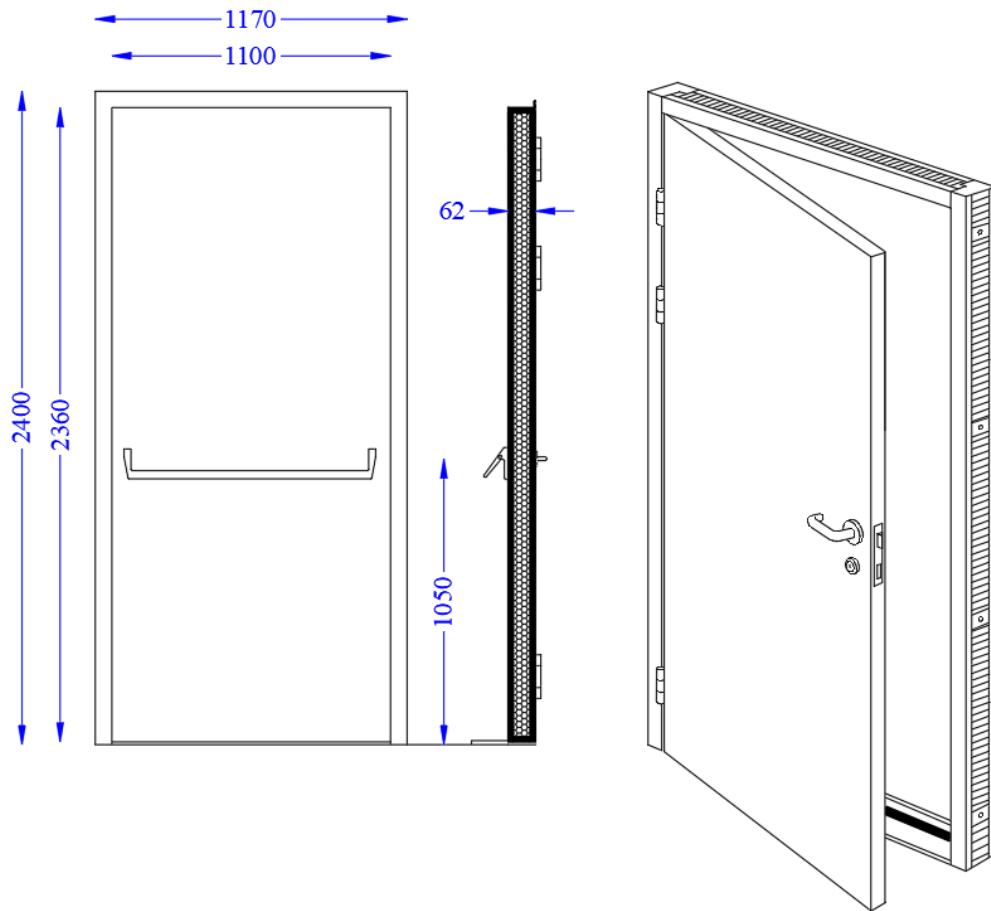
Construction details and dimensions (mm) of the fire door specimen.
